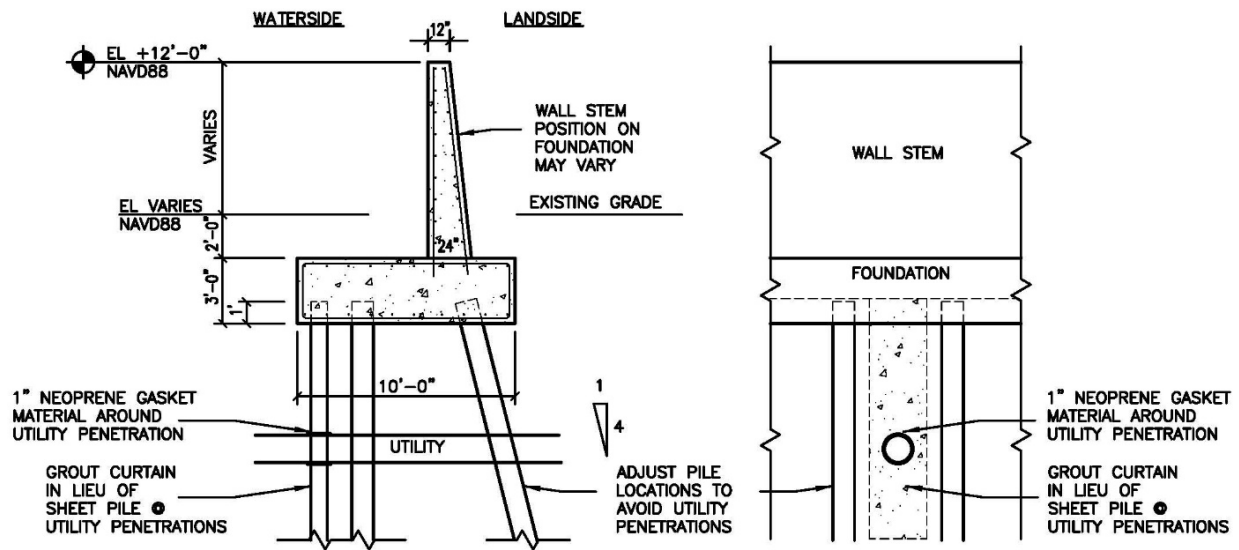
Grout Curtain Cutoff Wall Construction at Utility Crossings
